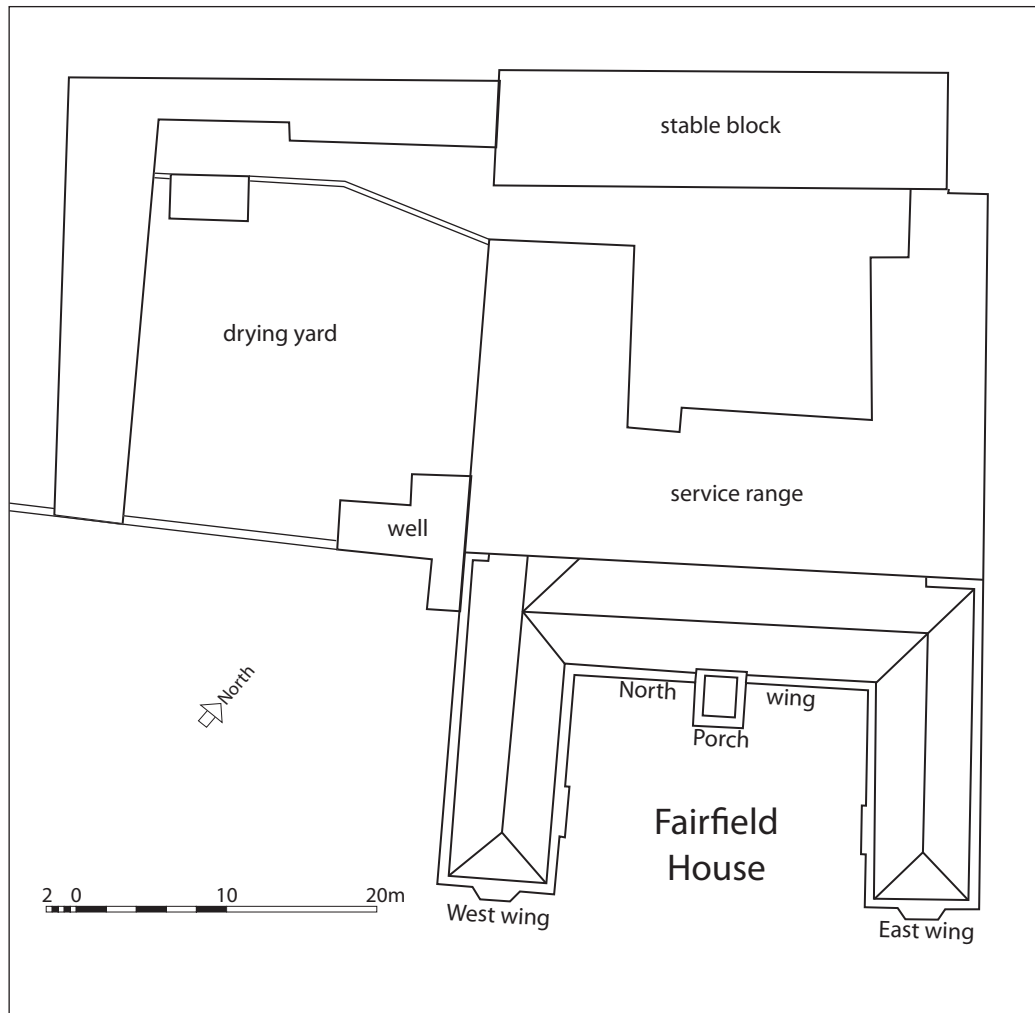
Plan of Fairfield House with, in outline, the service ranges to the north.
